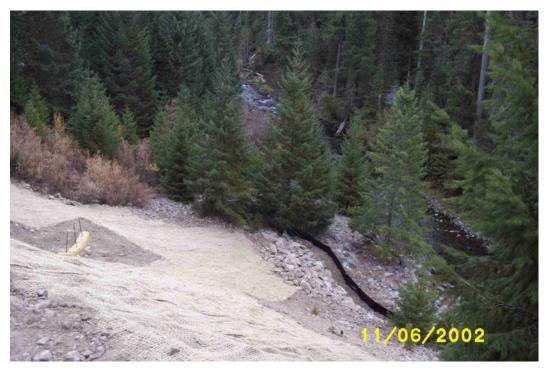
LM2-27 Downstream Site—After
